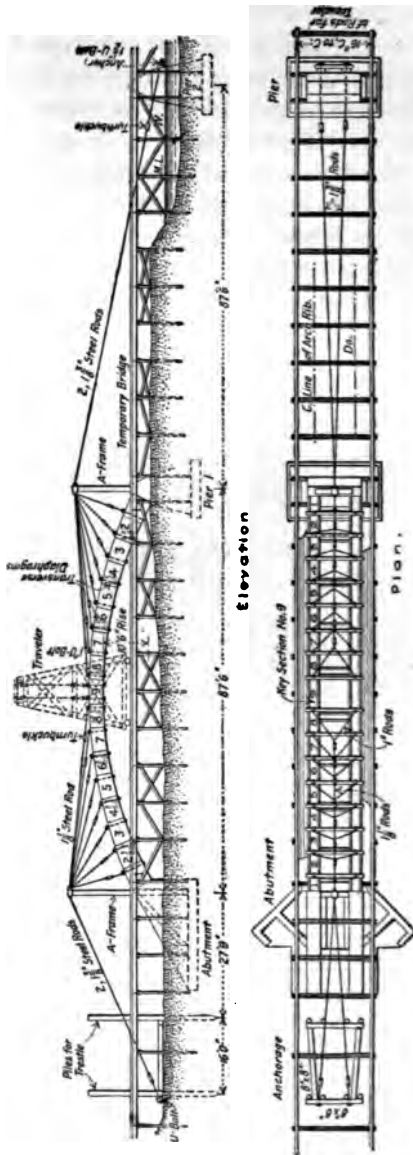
Arrangement Adopted in Erecting Rivoldere Bridge.
